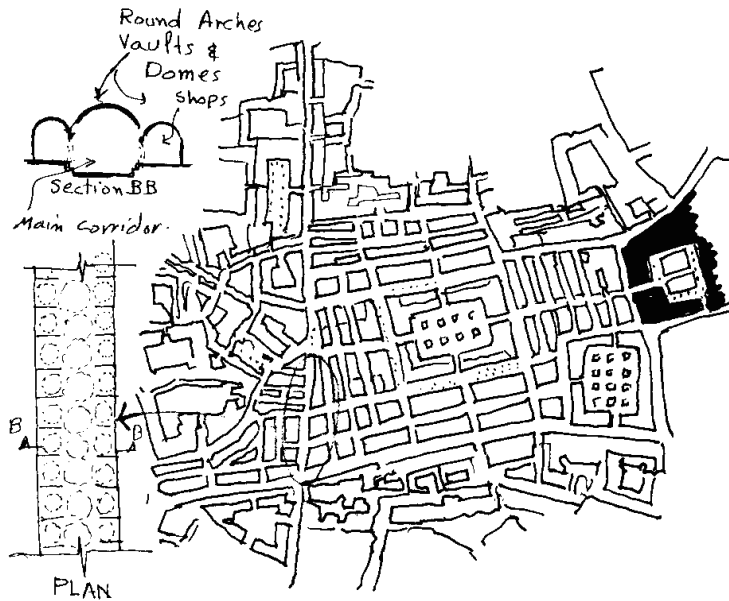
Lay out plan and detail of Istanbul Bazaar, Source: Authors
